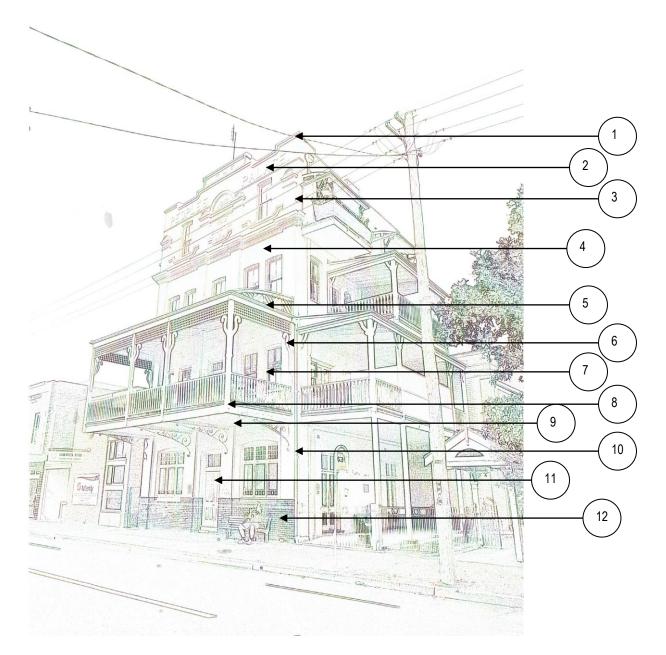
Potential Colours for the People's Palace – Scheme B (marked on an edited photograph)
